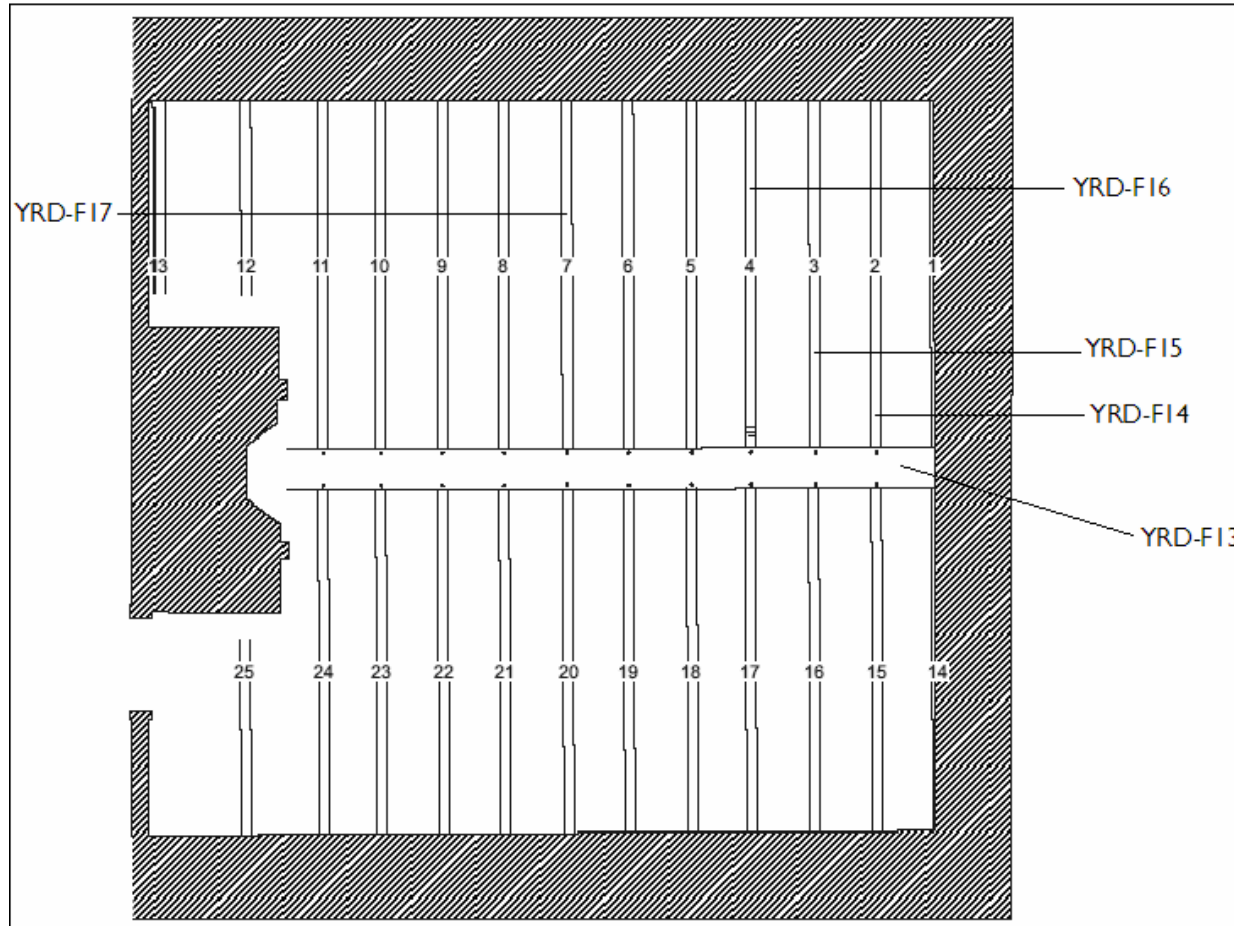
South range; Second floor joists, showing the location of samples YRD-FI3–I7 (John Allan)
